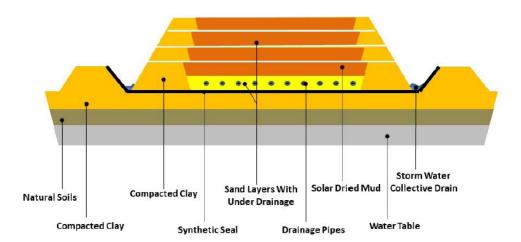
Schematic showing construction method of a typical residue drying bed
